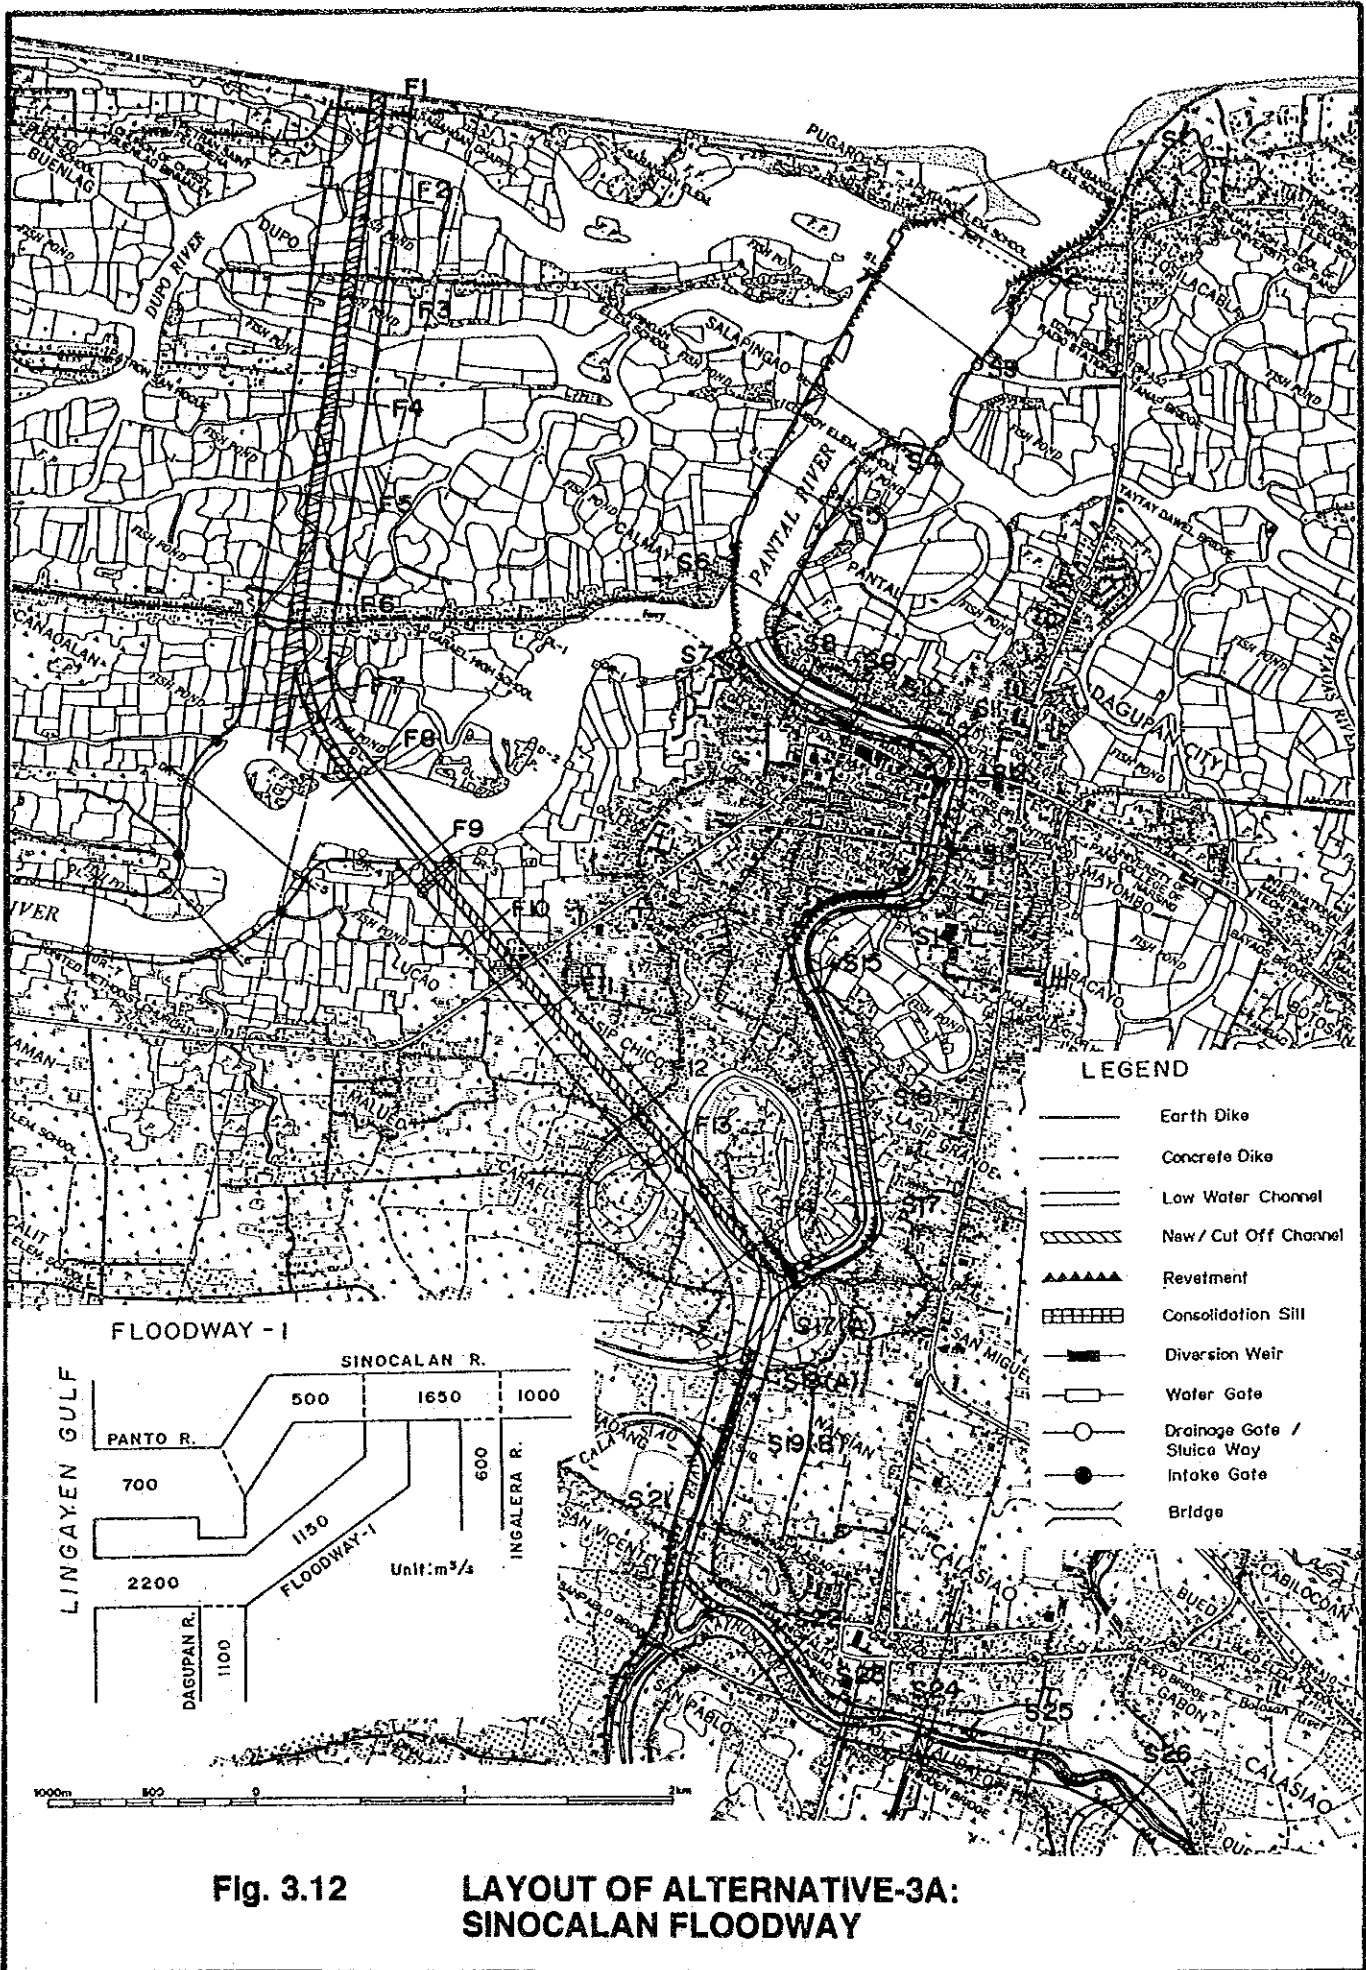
LAYOUT OF ALTERNATIVE-3A: SINOCALAN FLOODWAY
